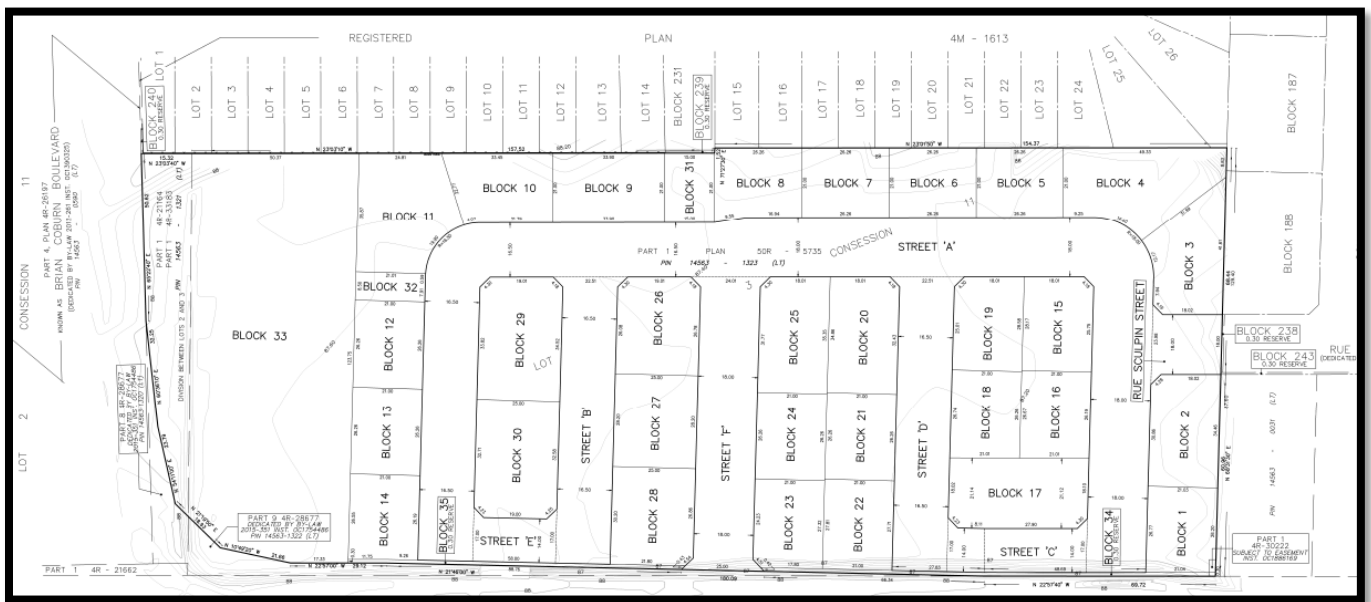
Proposed Draft Plan of Subdivision (2275 Mer Bleue Road)
